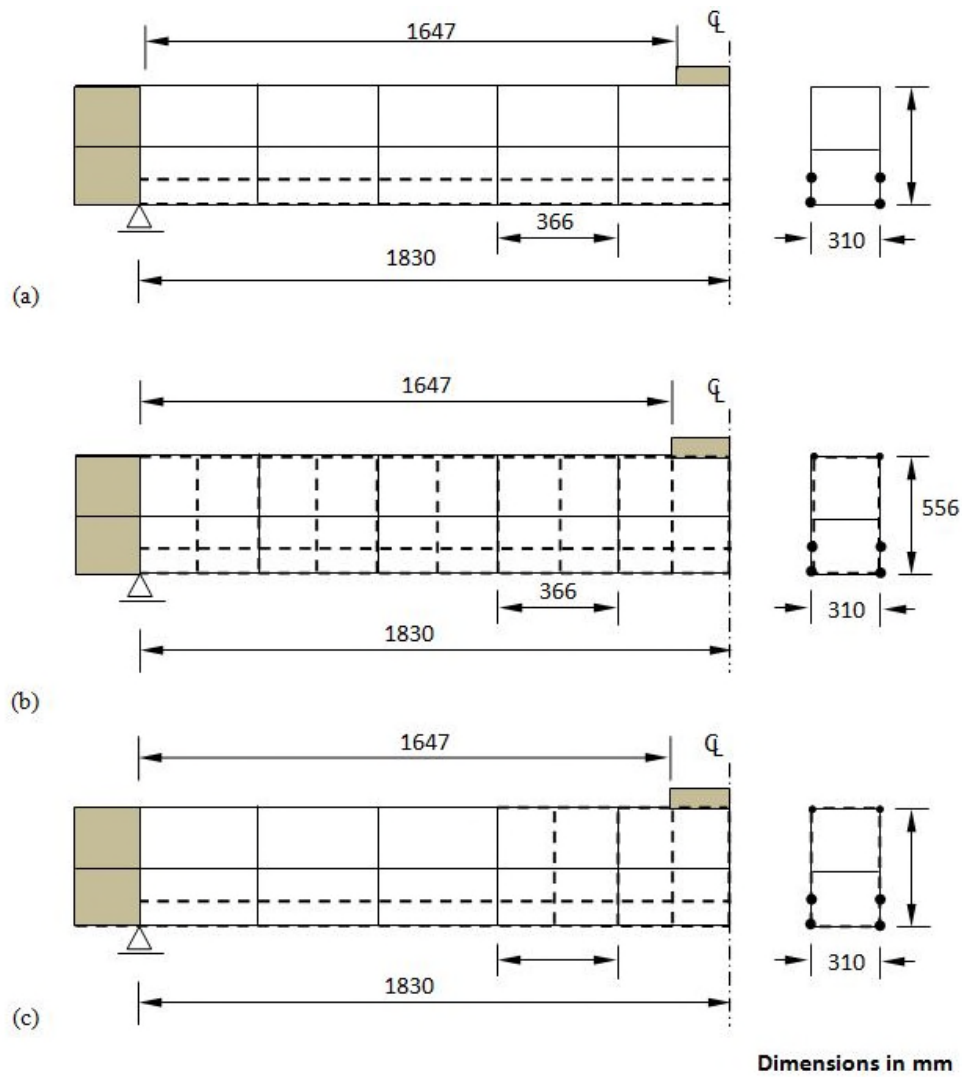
Finite element characterization of beams: (a) B and NB; (b) BS; and (c) NBS
